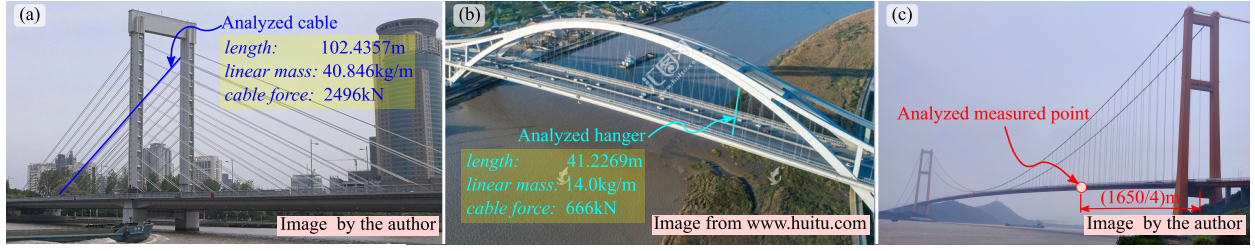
Actual structures that generate the vibrations. (a) A cable of a cable-stayed bridge, span layout: (105+97)m. (b) A hanger of a half-through arch bridge, span layout: (100+450+100)m. (c) The girder of a suspension bridge, span layout: (578+1650)m.
